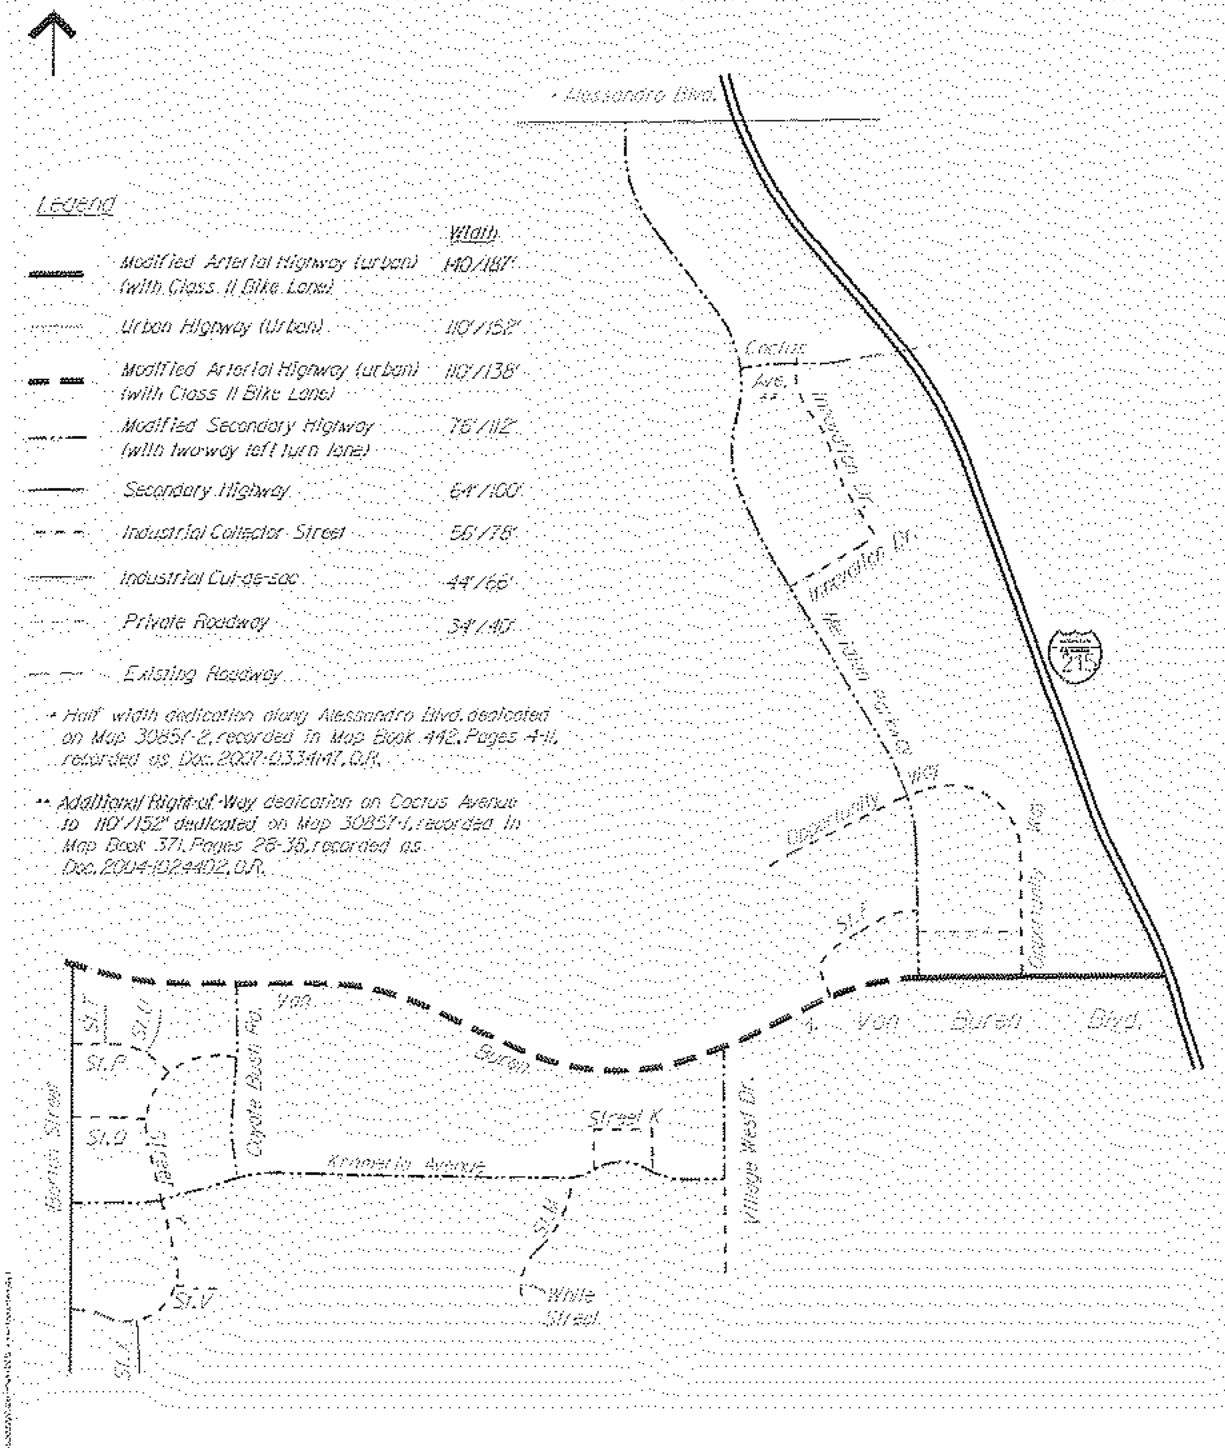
MARCH JOINT POWERS AUTHORITY GENERAL PLAN ROADWAY CROSS-SECTIONS
